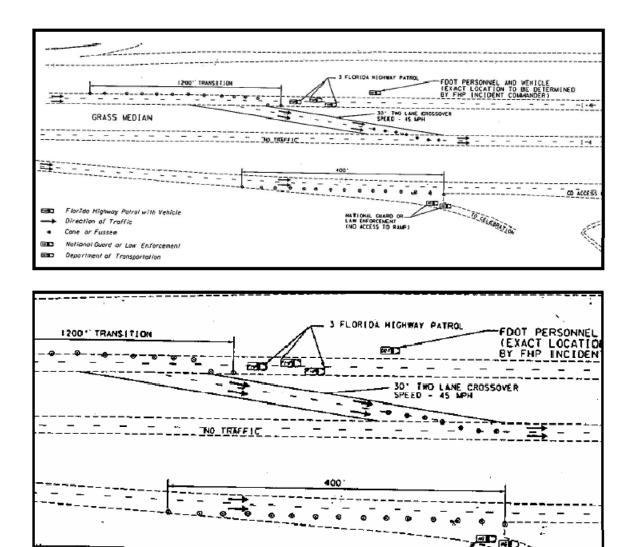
Previous I-4 Contraflow Design Plans at SR 417
